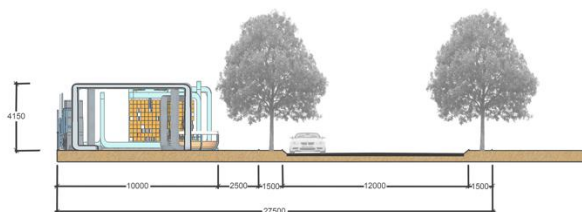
Section drawing of proposed design model on Thang Long sidewalk
